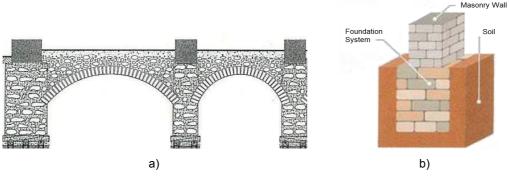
Foundation system: a) Caissons and arches structure (Silva, 2007); b) Continuous walls in limestone masonry (Appleton, 2003).
